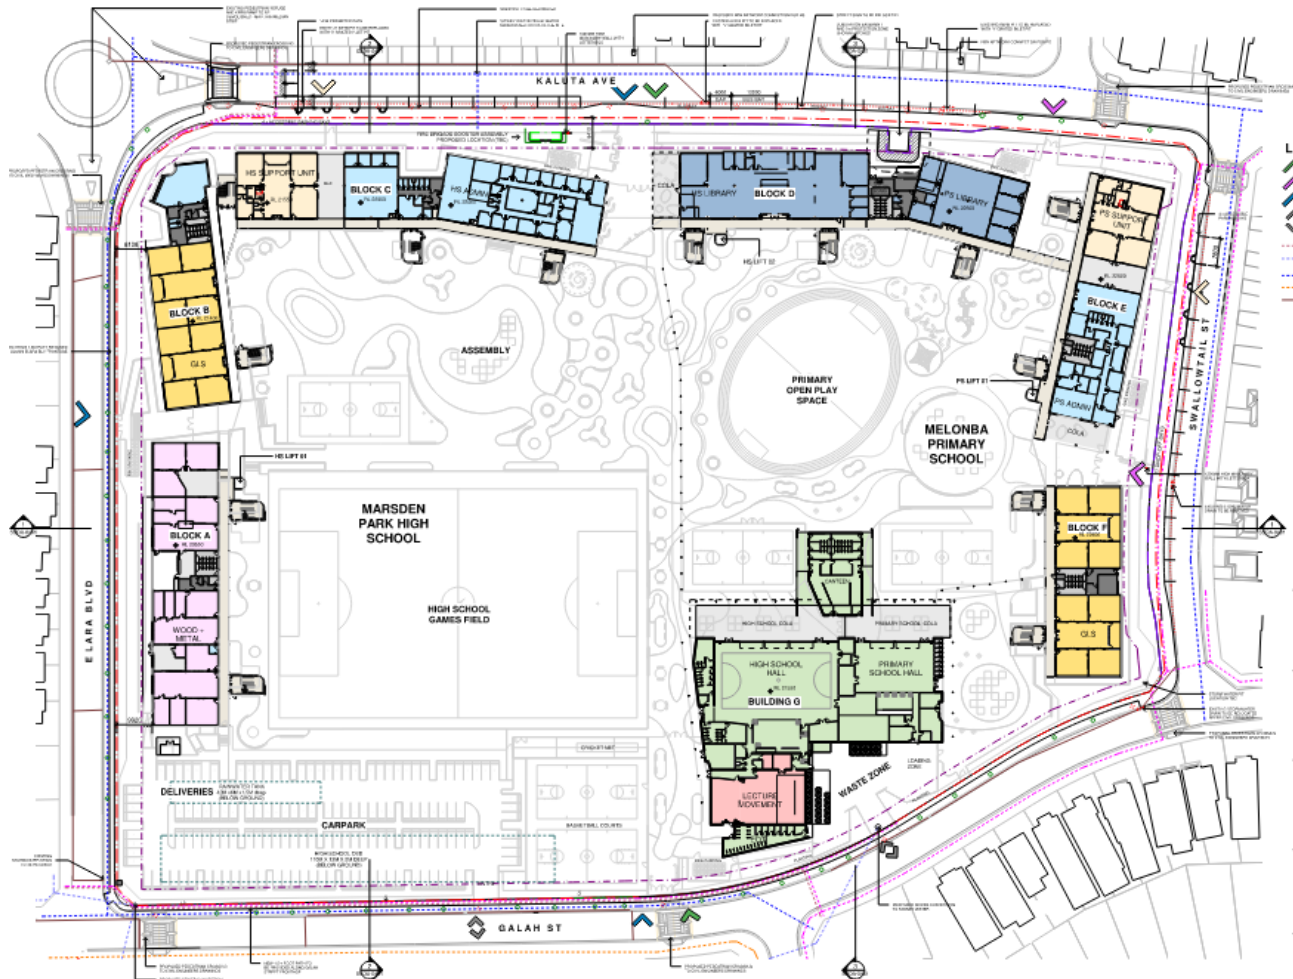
Proposed Concept Site Plan (NBRs)
